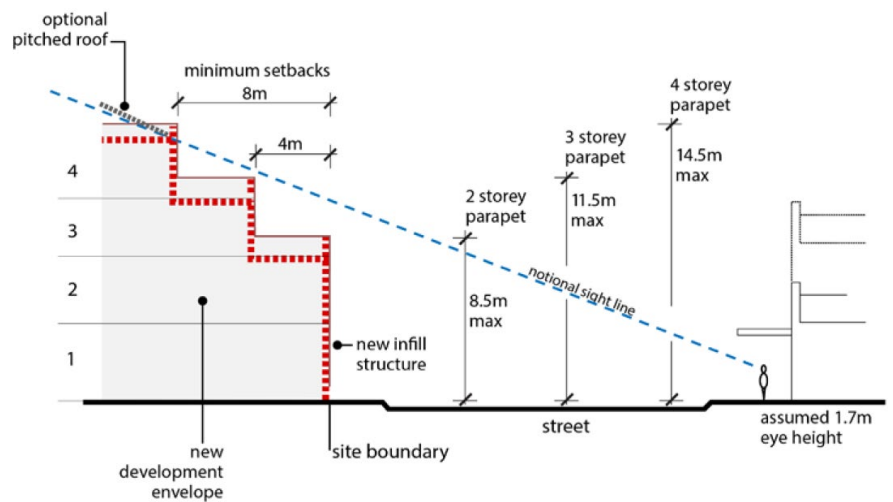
Front setbacks for new building in Area 1 (source: exhibited DDO21)
